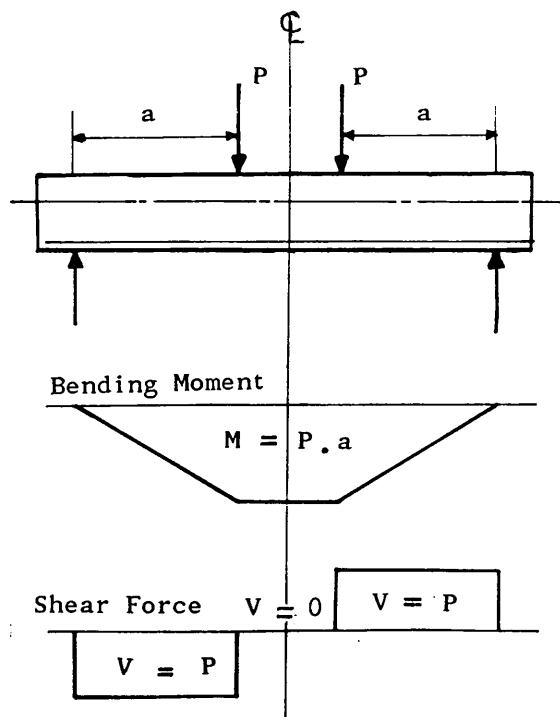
TYPICAL LOADING ARRANGEMENT OF BEAMS FOR INVESTIGATION OF SHEAR FAILURE
